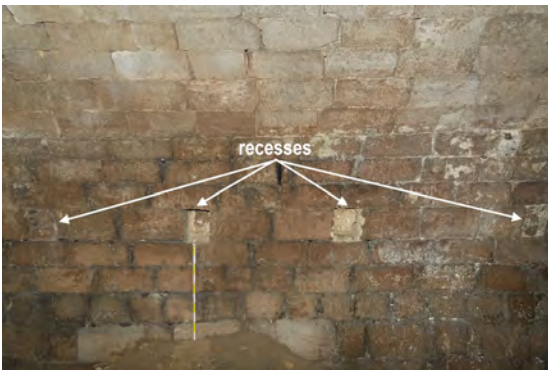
North wall of cistern (Source: BAI/GPIA).
